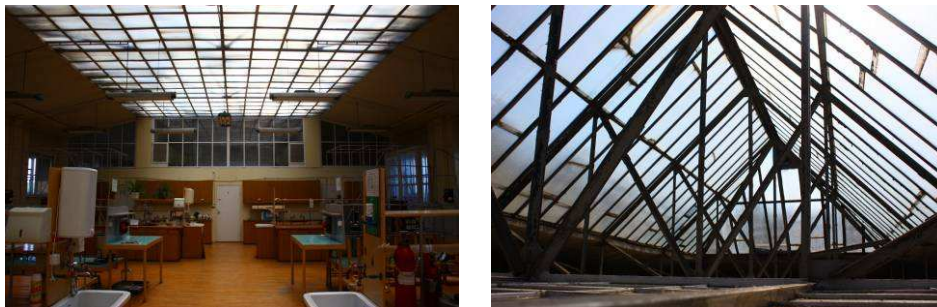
The steel structure of the flat roof: the glass suspended ceiling (left) and truss girders in the transverse layout (right)
